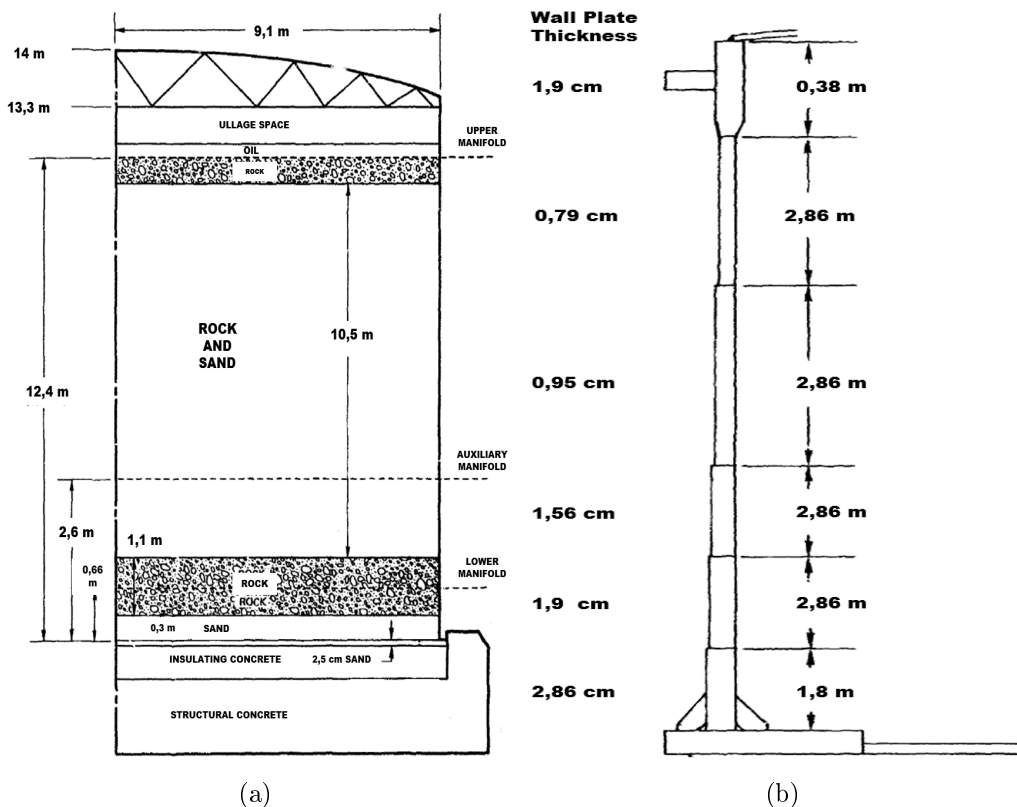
Thermal storage unit of Solar One: (a) Construction details, (b) Tank cross-section (Faas (1983b))
